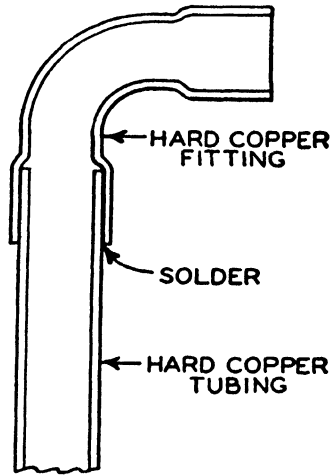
Cross-section of soldered joint in hard copper tubing.
